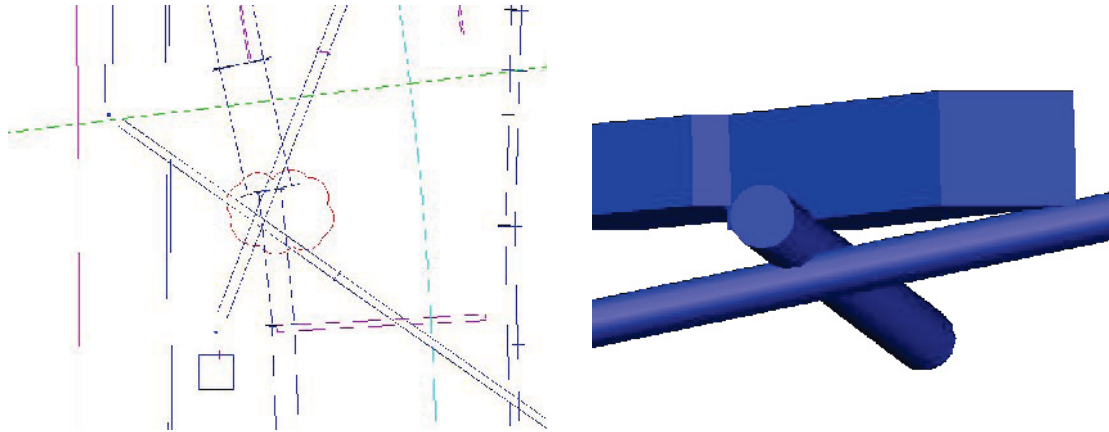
A duct bank intersects with the existing and proposed sewer line
